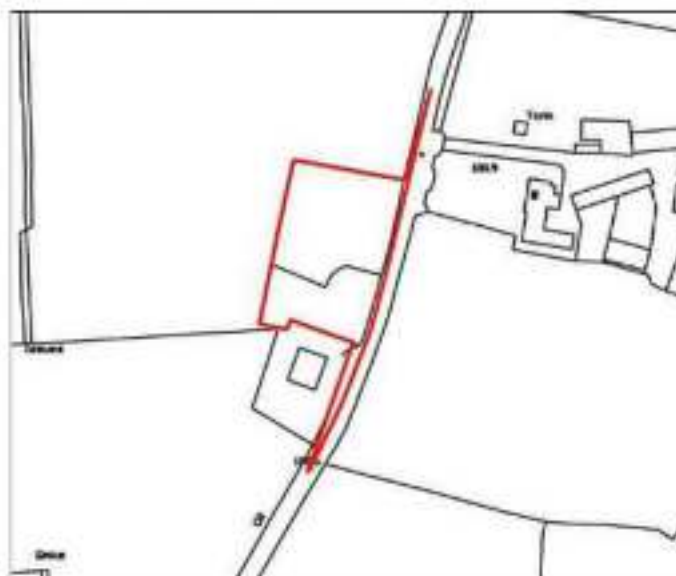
Extract from Site Block Plan Drw J Fegan 4 (application number LA07/2022/1534/F)
